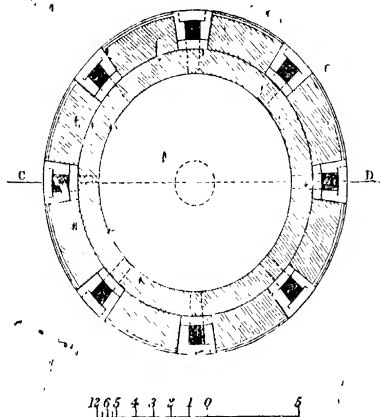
Plan of kiln taken at top of fire-holes at level AB, Fig. 49.
